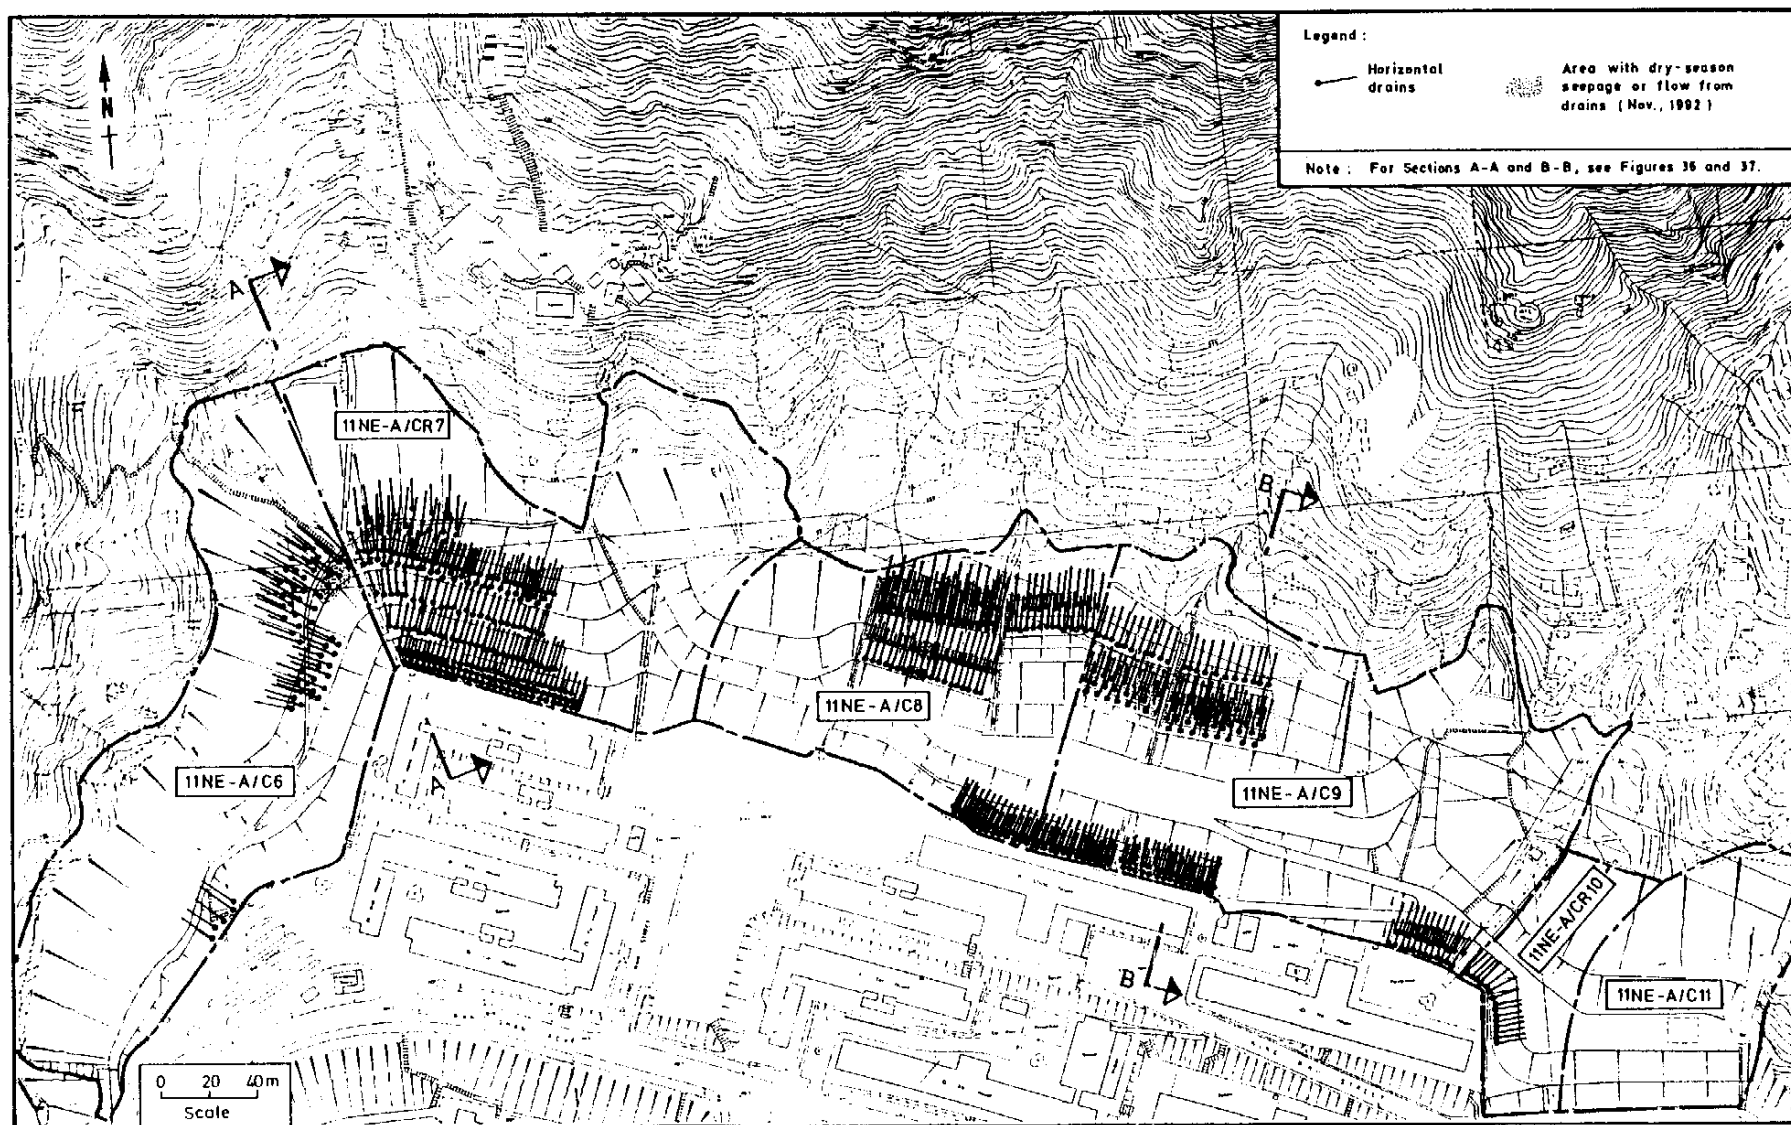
Layout of Horizontal Drains at Tsz Wan Shan Estate
